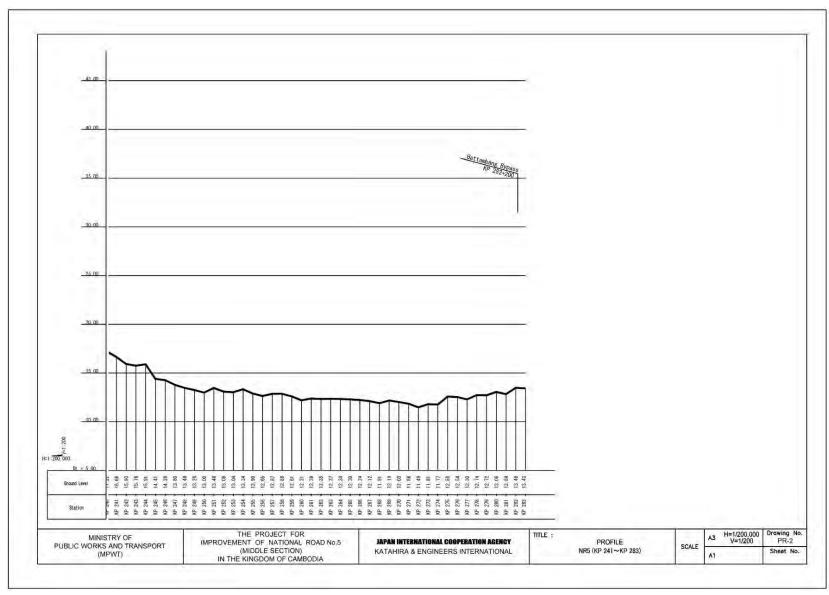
Road Elevation of Middle Section: from KP 241 to KP 283
